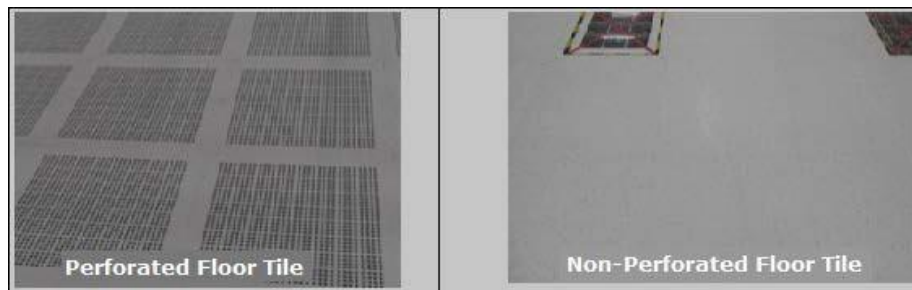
Perforated Floor Tile and Non-Perforated Floor Tile
